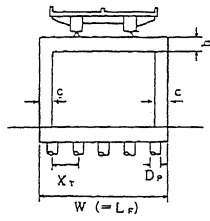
Rigid-Frame Pier and Pile Foundation System Supporting Three-Span Continuous Box Girder Bridge
